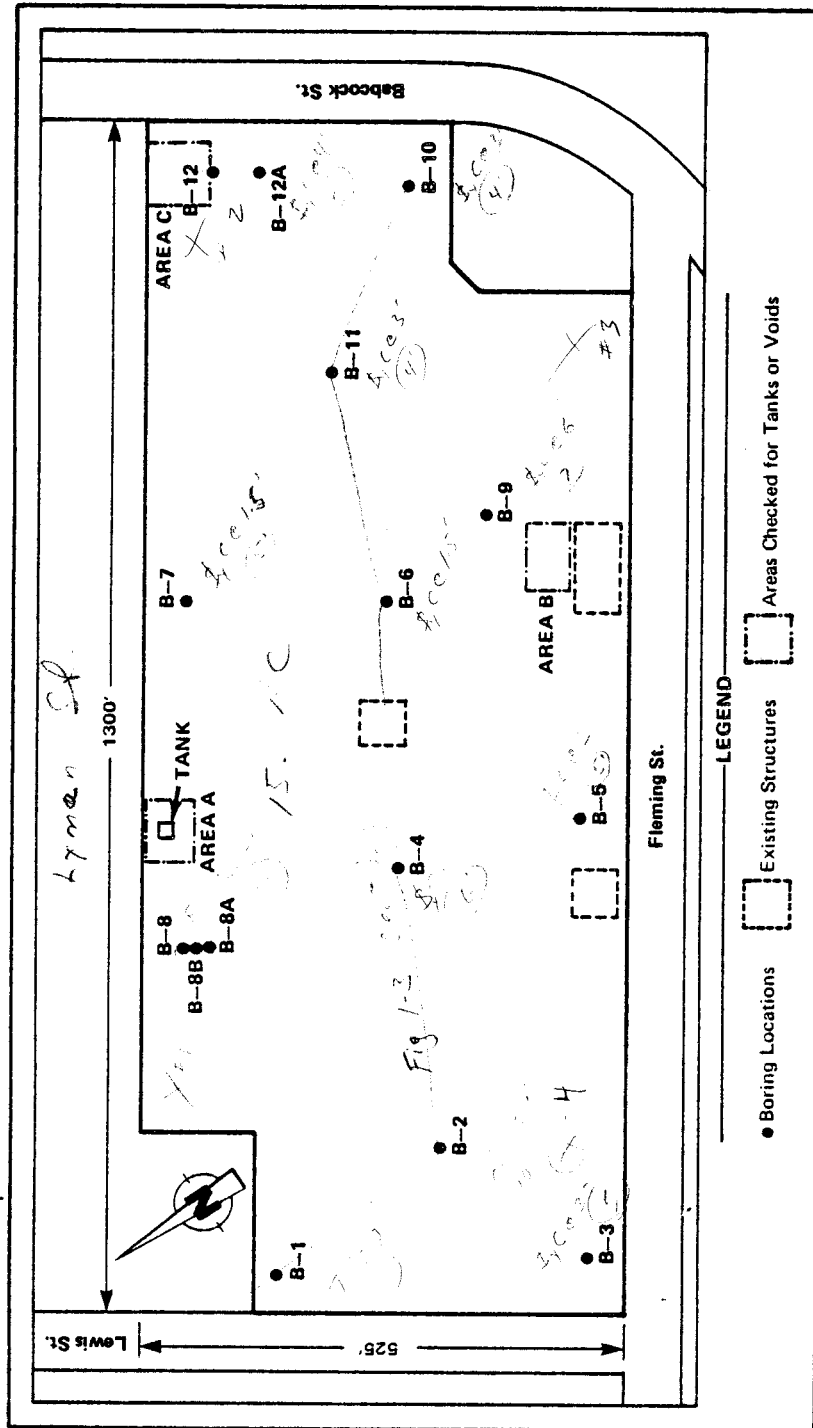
LOCATION OF BOREHOLES ON BABCOCK STREET SITE
